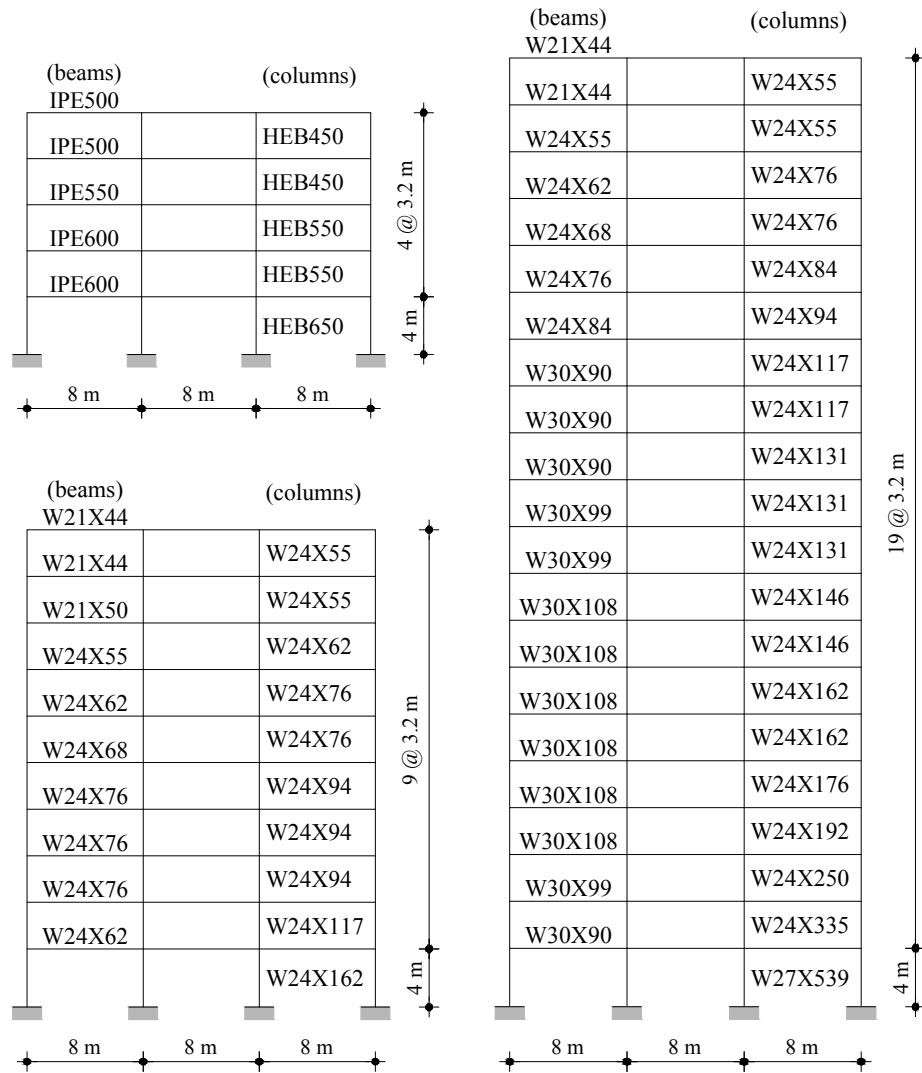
Elevation view and beam/column cross-sections of the steel MRFs
